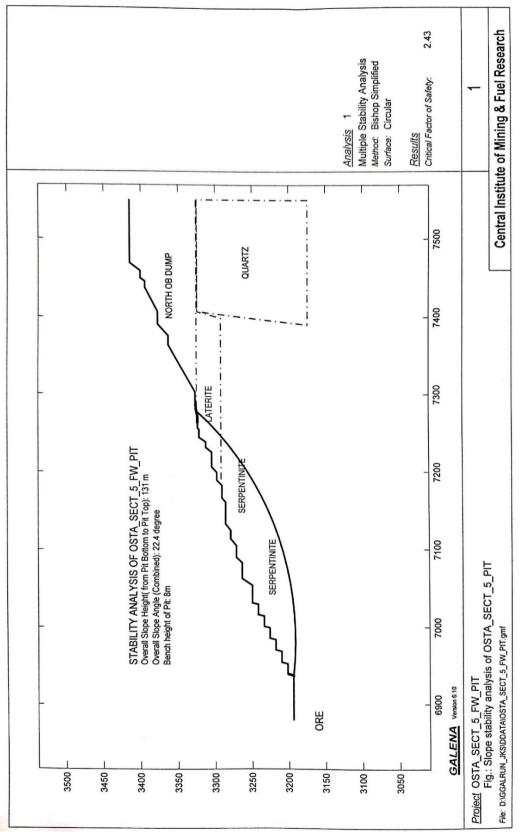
Slope stability analysis of Planned Footwal Pit along Section Sect-5
